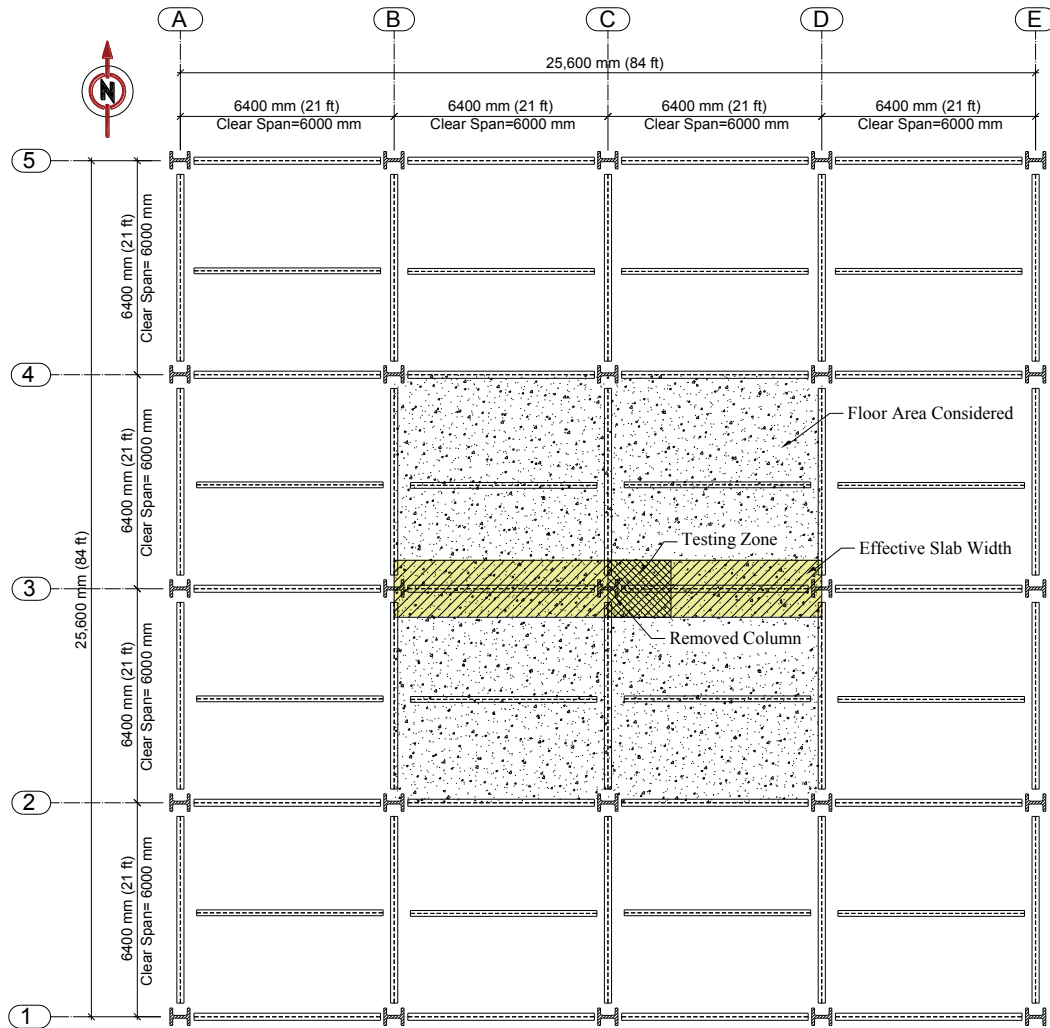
Plan Layout of 4x4 Bay Frame Building with Clear Span of 6.0 m
